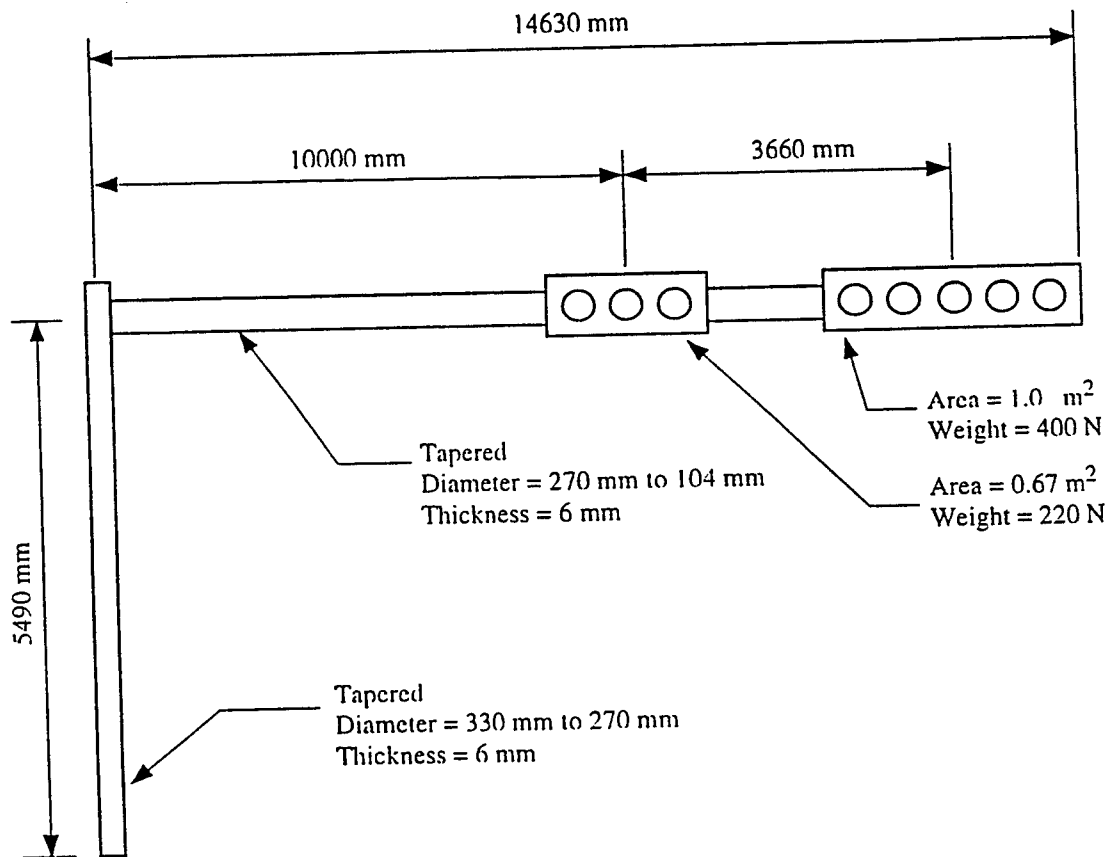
Details of Full-Scale Cantilevered Signal Support Structure (Signal Support #2)
